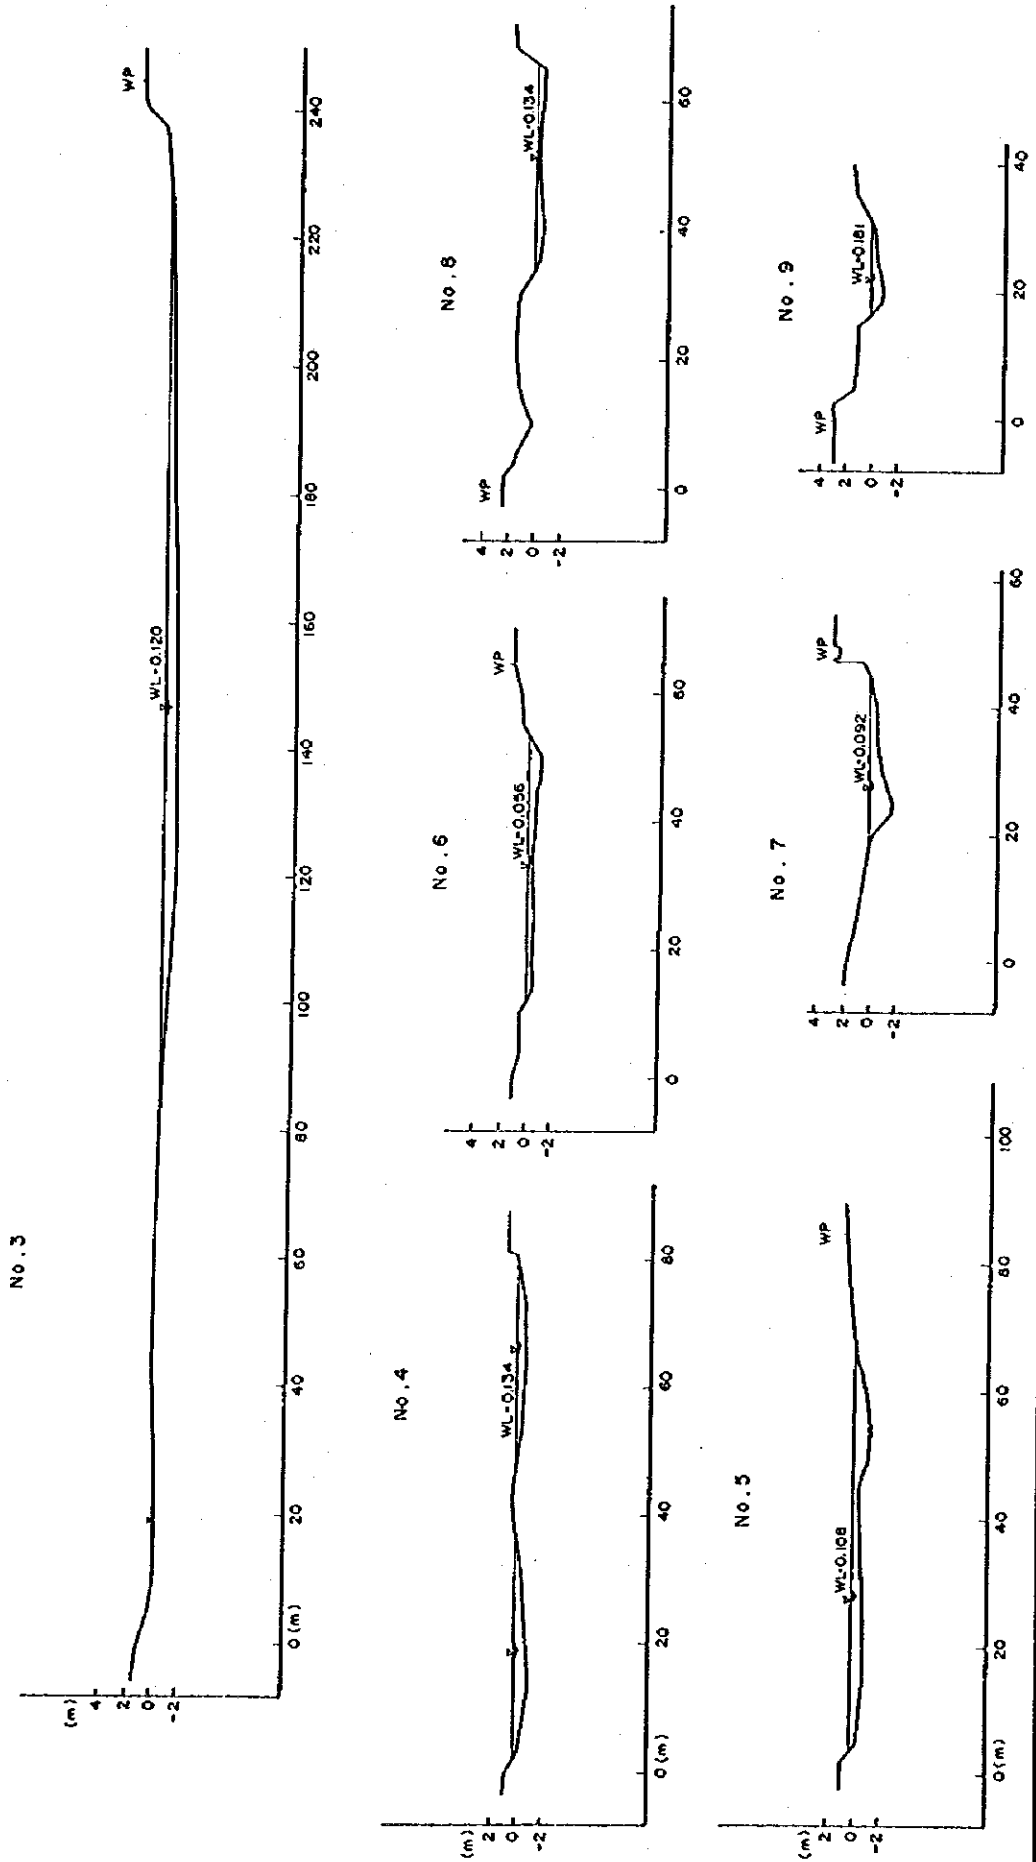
(3) Cross-Section (R. Rayong - 3)
